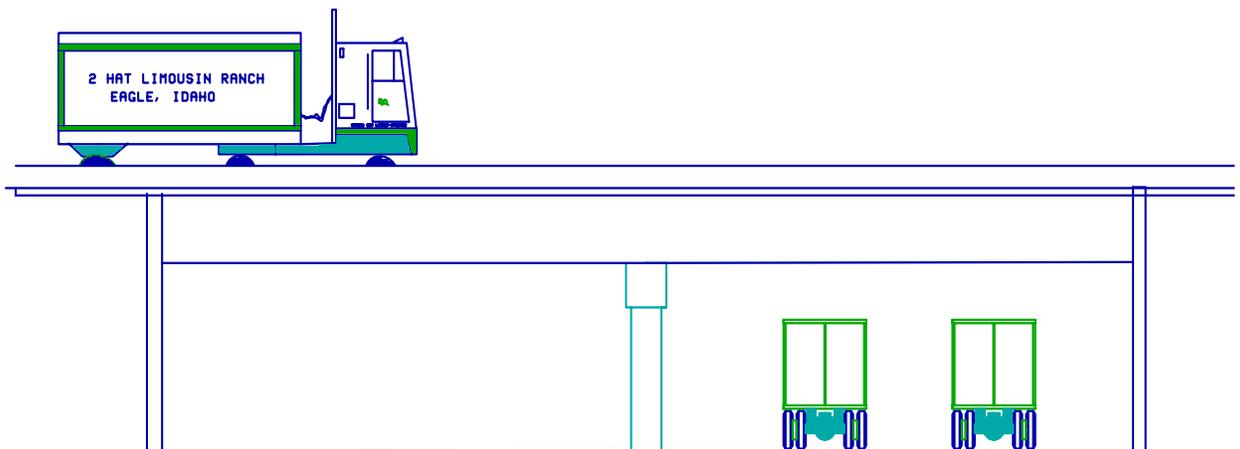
DEPRESSED ROADWAY TUNNEL EFFECT
